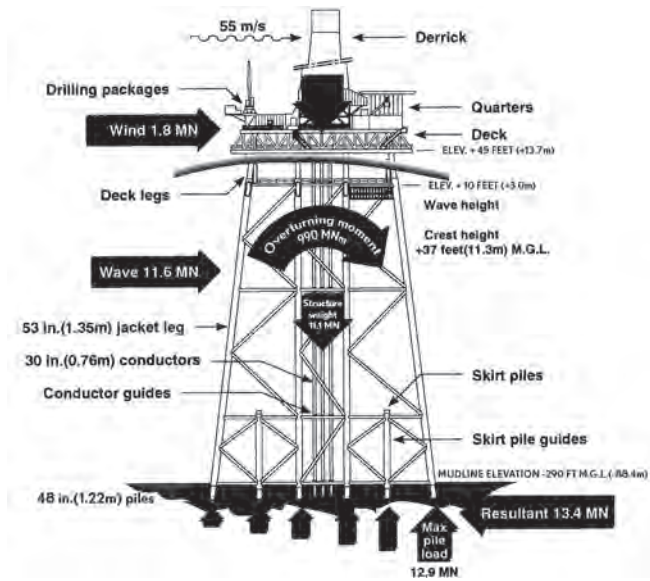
Example of a jacket structure with leg piles and skirt piles (for the Gulf of Mexico in 290 ft - 88.4 m - water depth)
